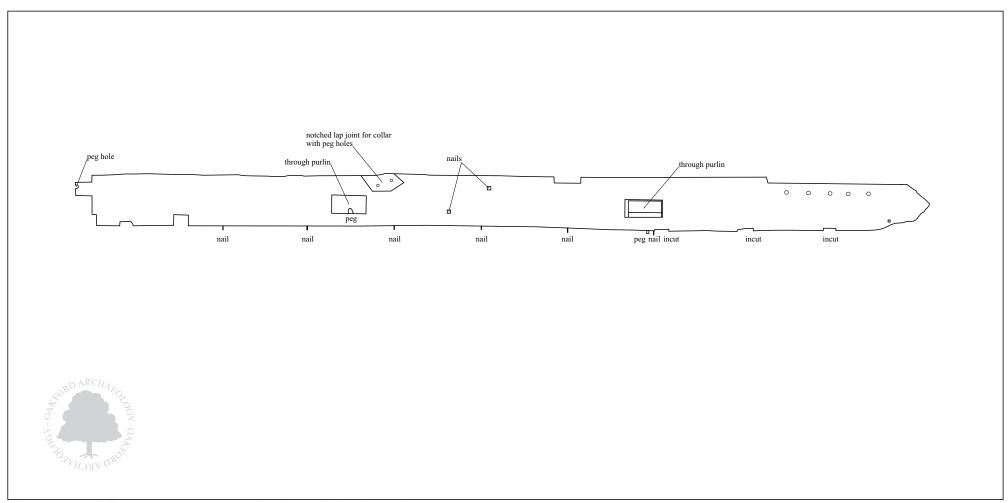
Second floor, Room S04 re-used primary jointed cruck truss.
